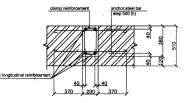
B: Horizontal Wall Section Showing Reinforced Concrete Column Reinforcement
